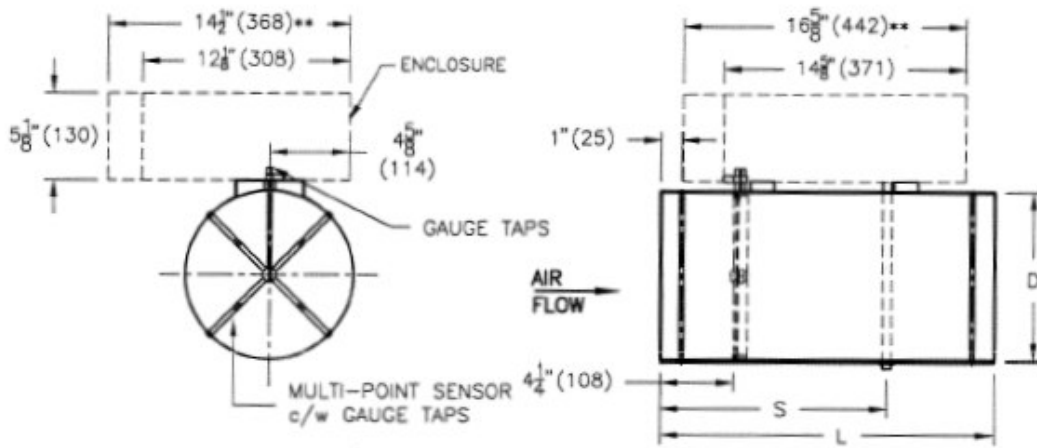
Laboratory Room Exhaust Air Terminal Dimensions in Inches (Millimeters).
